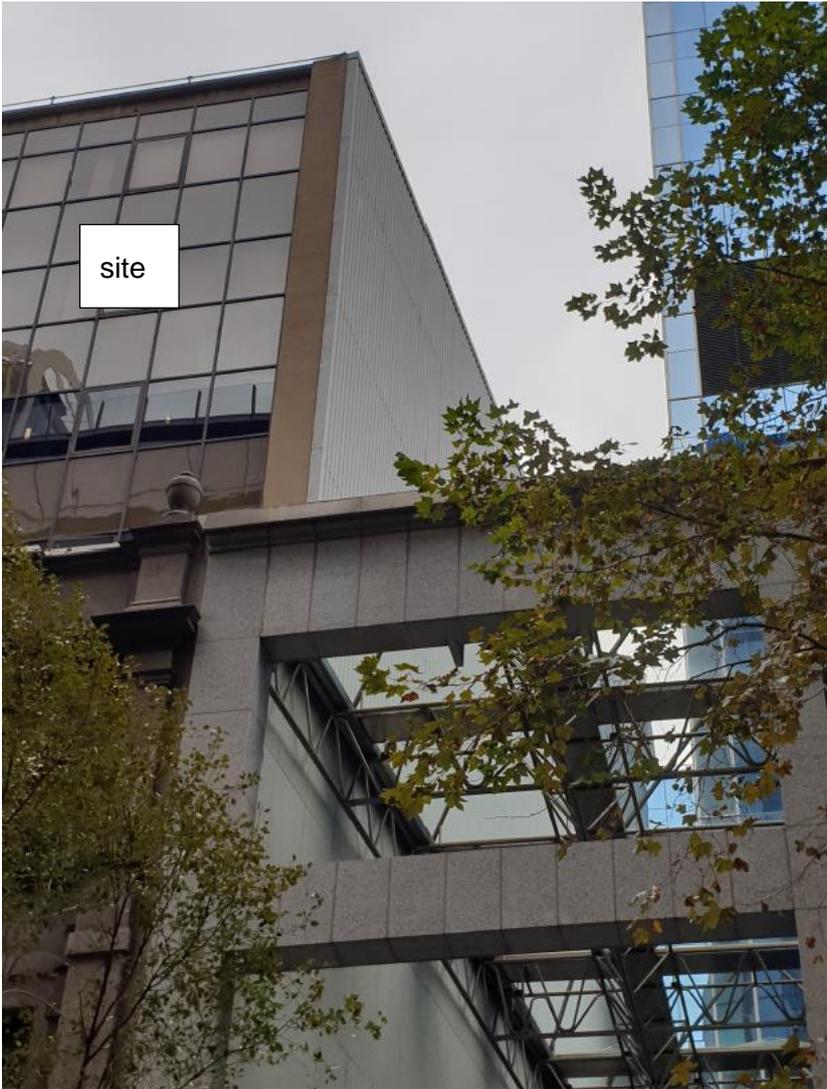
Canopy interface with northern neighbouring site at 309-329 Kent Street
